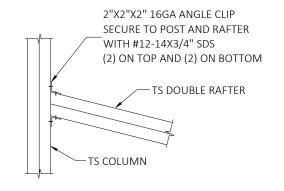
A LEAN TO RAFTER/COLUMN CONNECTION FOR RAFTER SPANS LESS THAN 12'-0"
